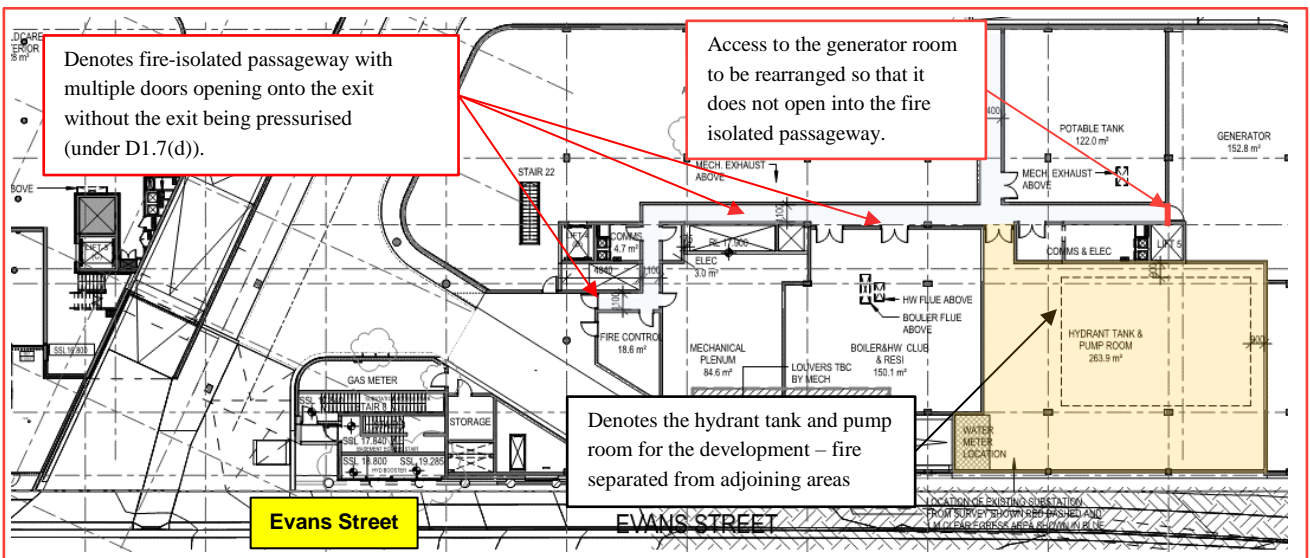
Fire-isolated passageway to pump room (extract from base building FER)
